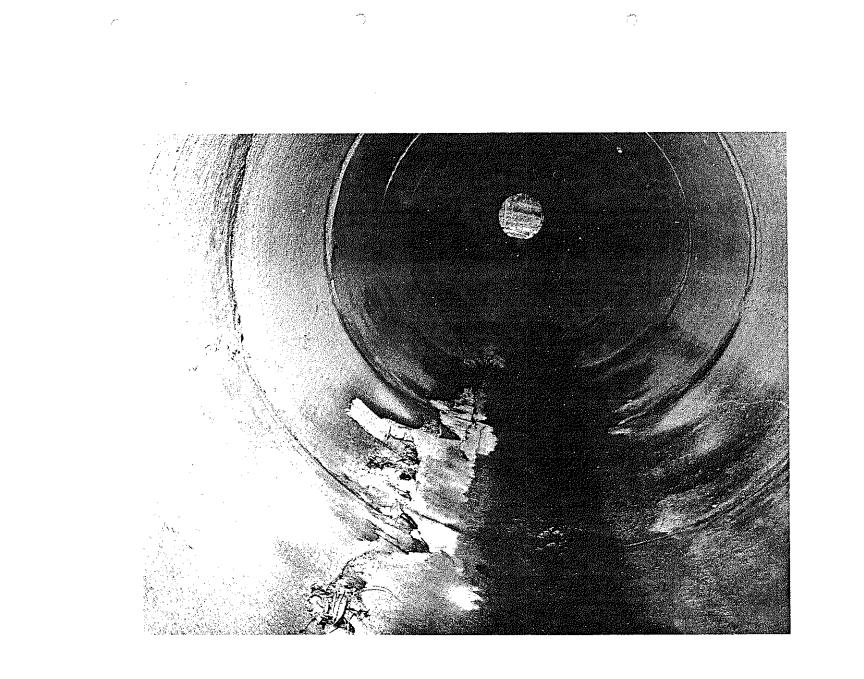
Failure in Bottom of 54-inch Culvert Under a 32-foot Fill, Station 1633 + I64-3(7)35, Shelby County
